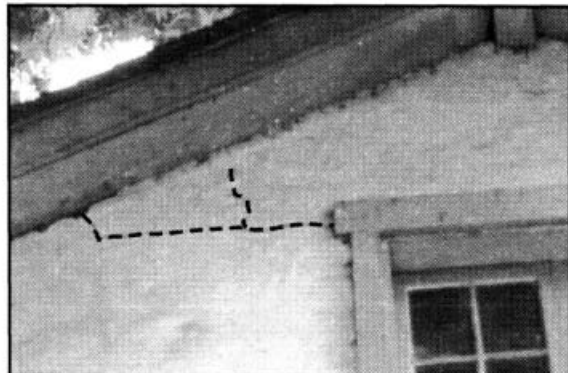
Detail of a crack in the north gable-end wall (dotted line along crack).
